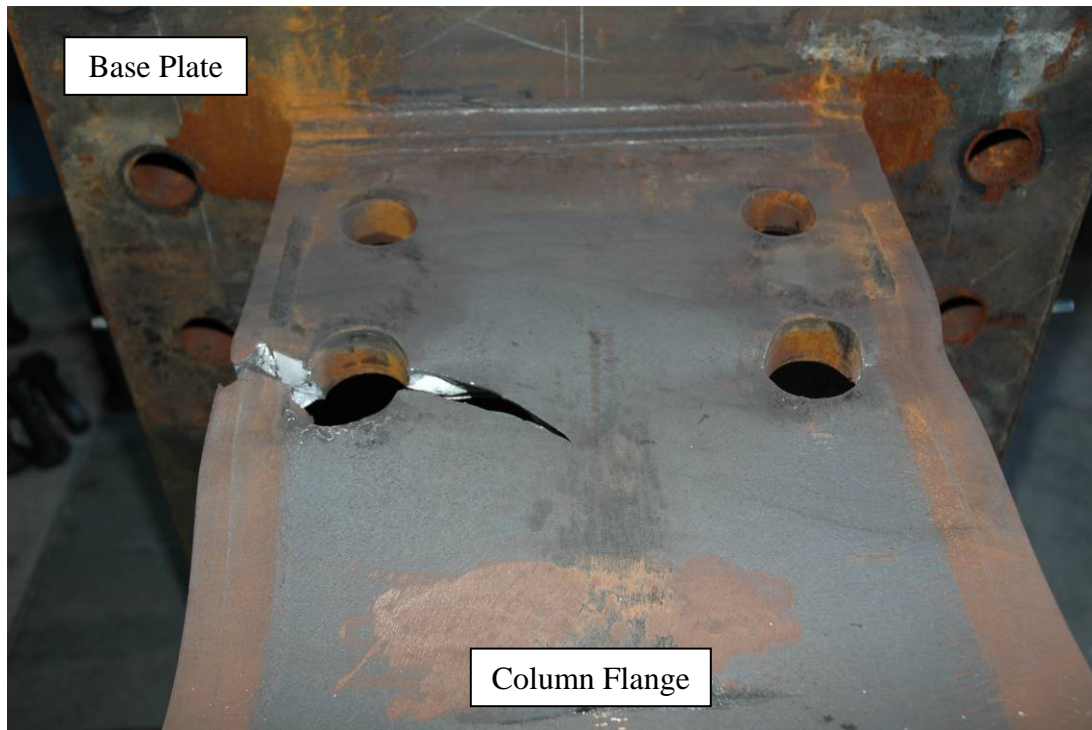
Specimen W14×176-35: Partial Column Flange Fracture (10% Drift)
